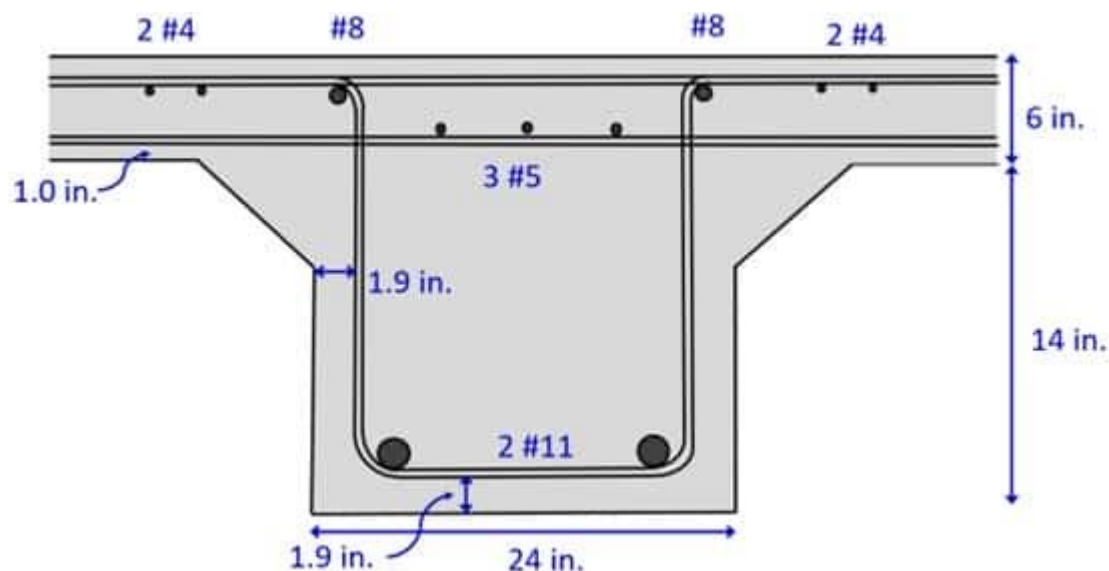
Sectional view of the bridge girder with reinforcement detailing
